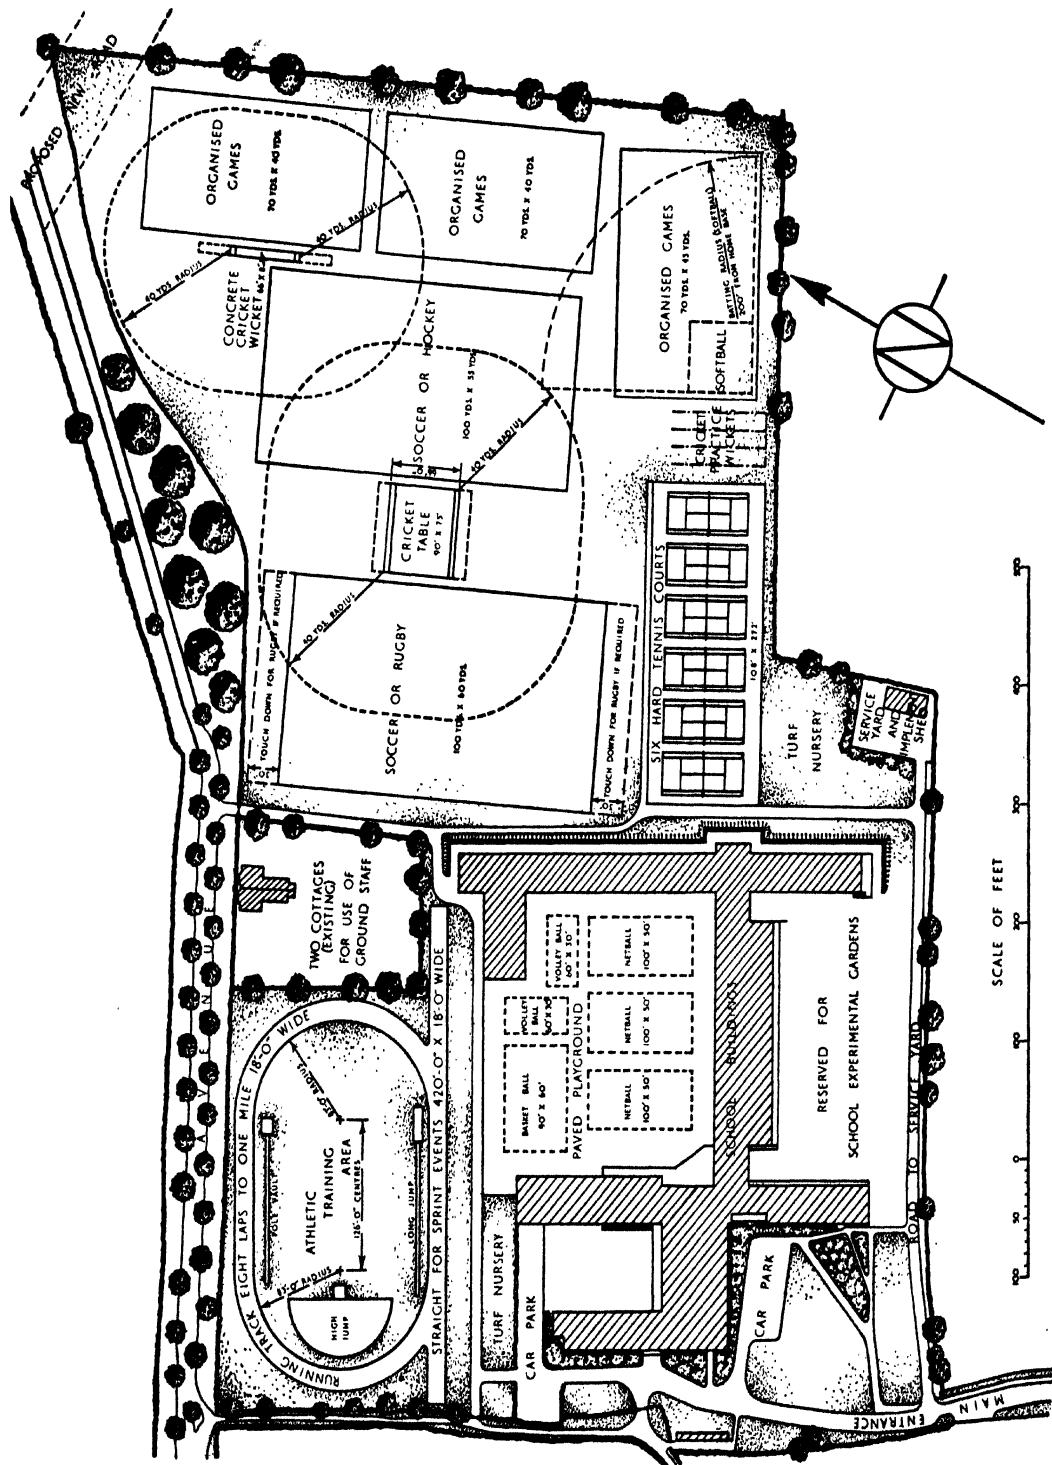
A 16-ACRE SCHOOL SITE WITH A 12-ACRE PLAYING FIELD LAYOUT
